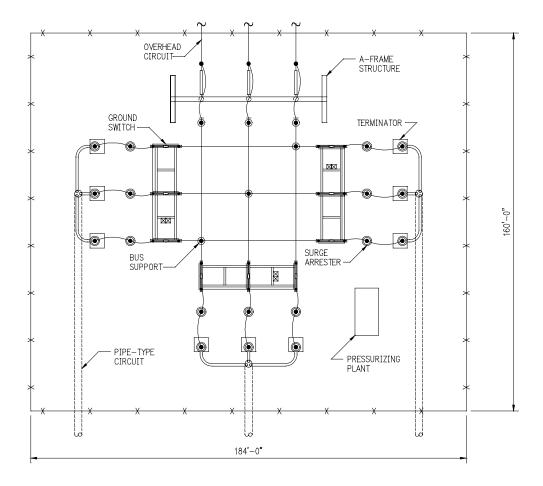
Plan view of potential 345-kV overhead/underground transition station.
